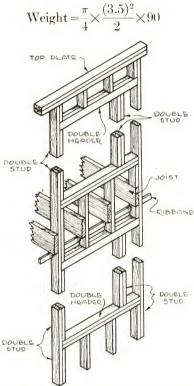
Framing for Two Window Openings in a Balloon Frame Bearing Wall
